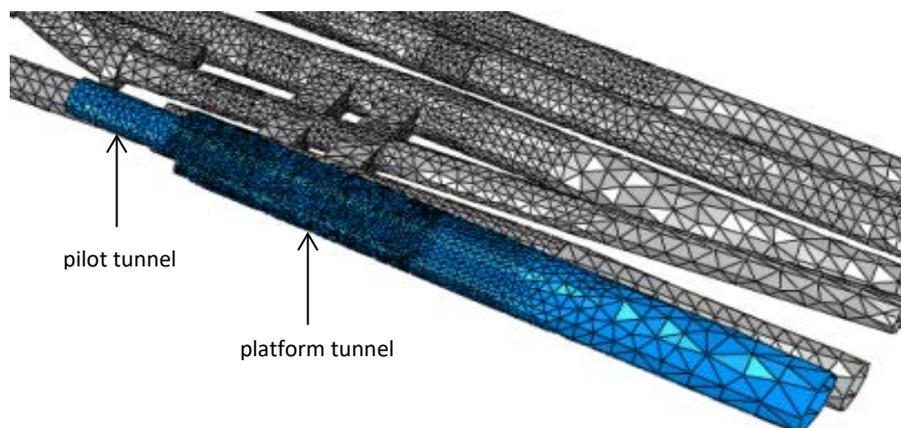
FE model of pilot tunnel and platform tunnel enlargement
